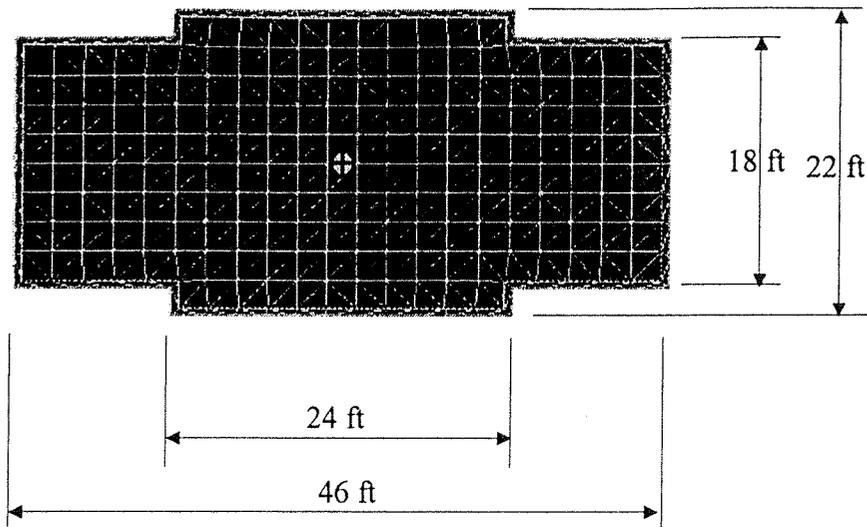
Section shape at bottom of Pier E1 (either south or north side)
